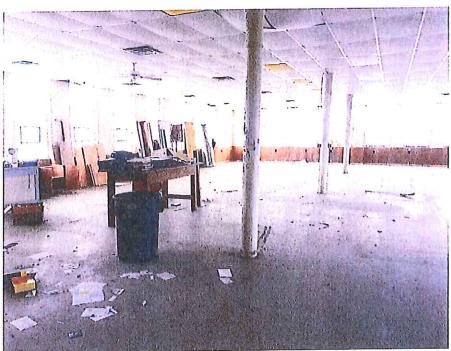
445-449 10th St. in 2018. Second floor featuring original open plan as utilized for manufacture of auto parts. Credit: Erin Claussen
